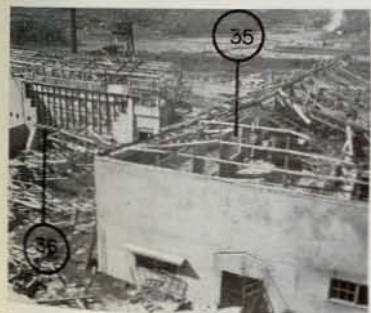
3,900 feet from GZ. Group 4. Buildings 35 and 36, looking southwest.
